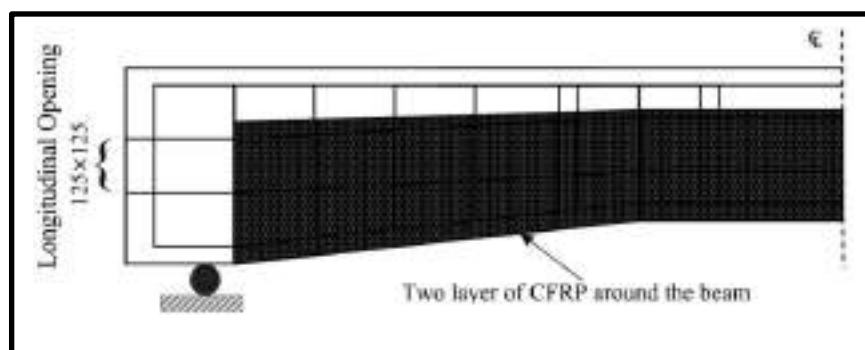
11): Reinforcement details of beam with an opening (HB30-RO2).
